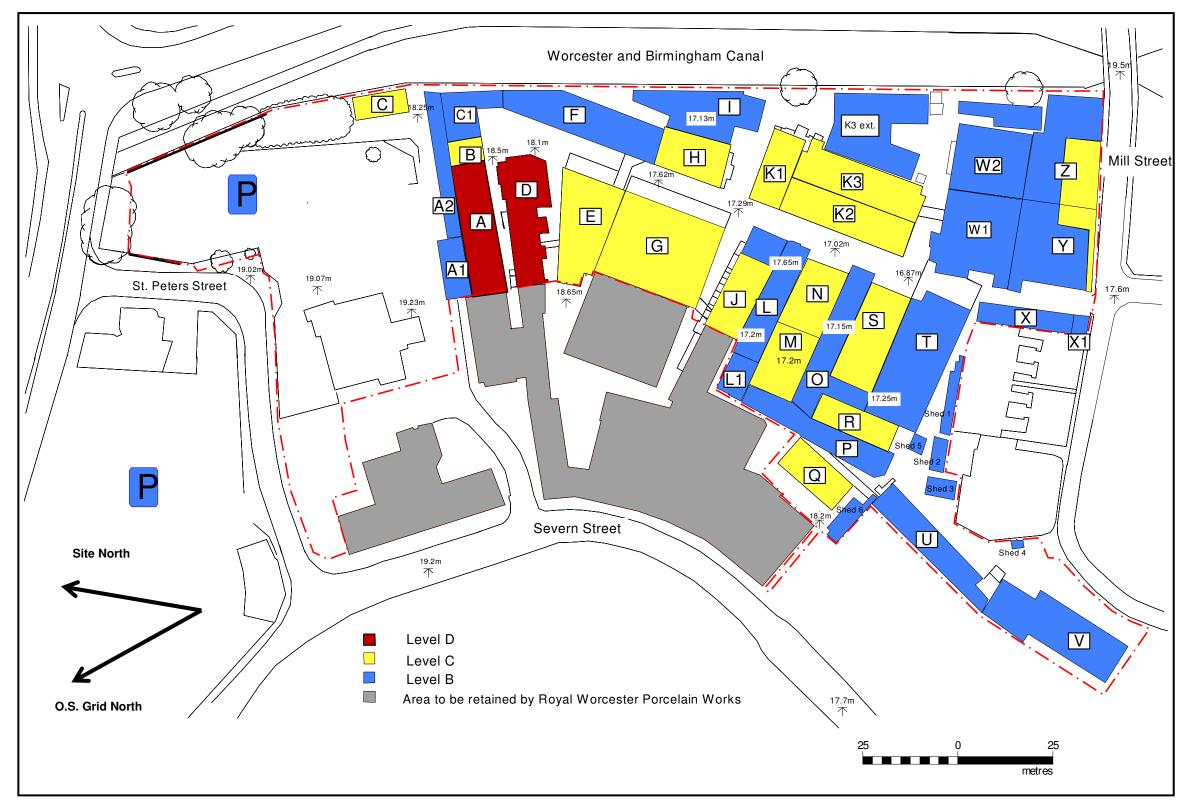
Detailed plan of site, building codes and levels of recording (scale 1:1,000 based on architect's drawing provided by Berkeley Homes)
